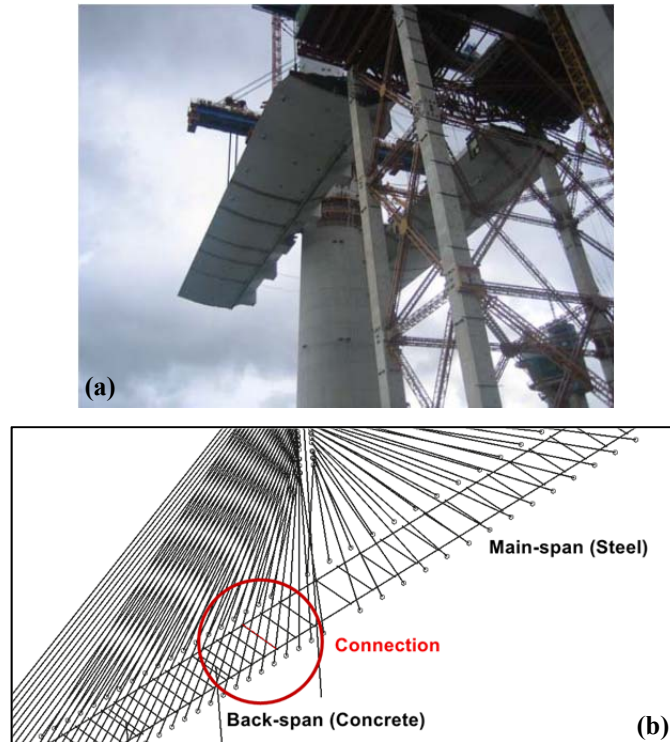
Connection between steel main span girder and concrete back-span. [7]
